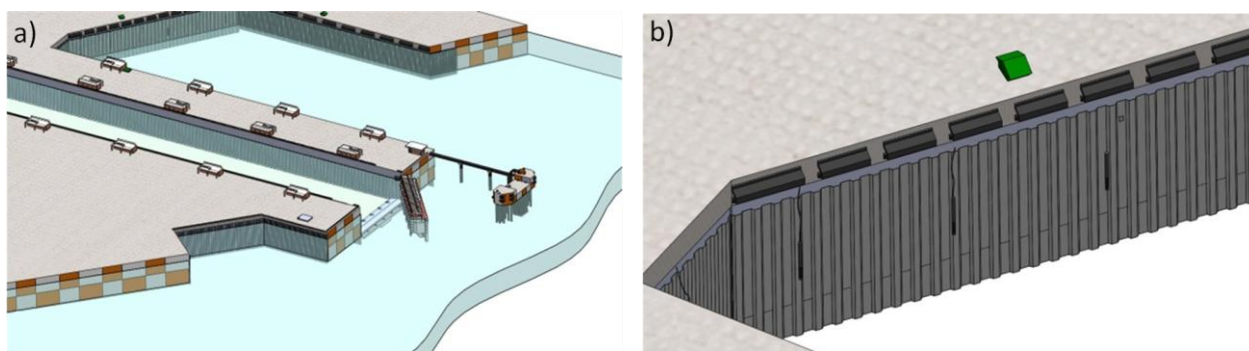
a) General distribution of the sheet piling. b) Bay Dock sheet piling detail.
